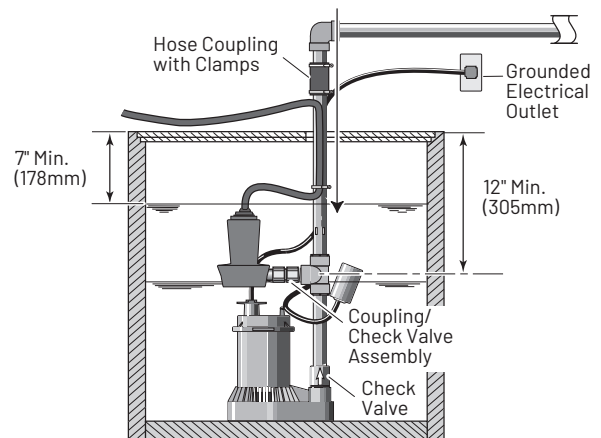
DOUBLE PUMP AND FLOAT SWITCH INSTALLATION
